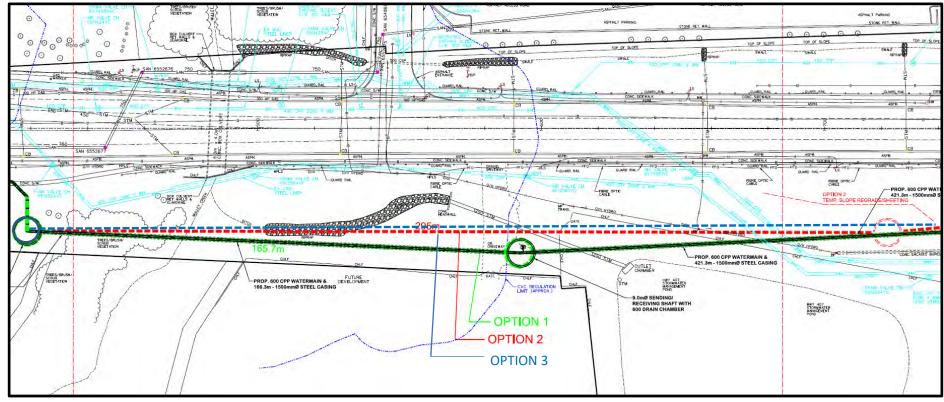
Edgeware Road to Meadowvale North Pumping Station Tunneling Section 1
